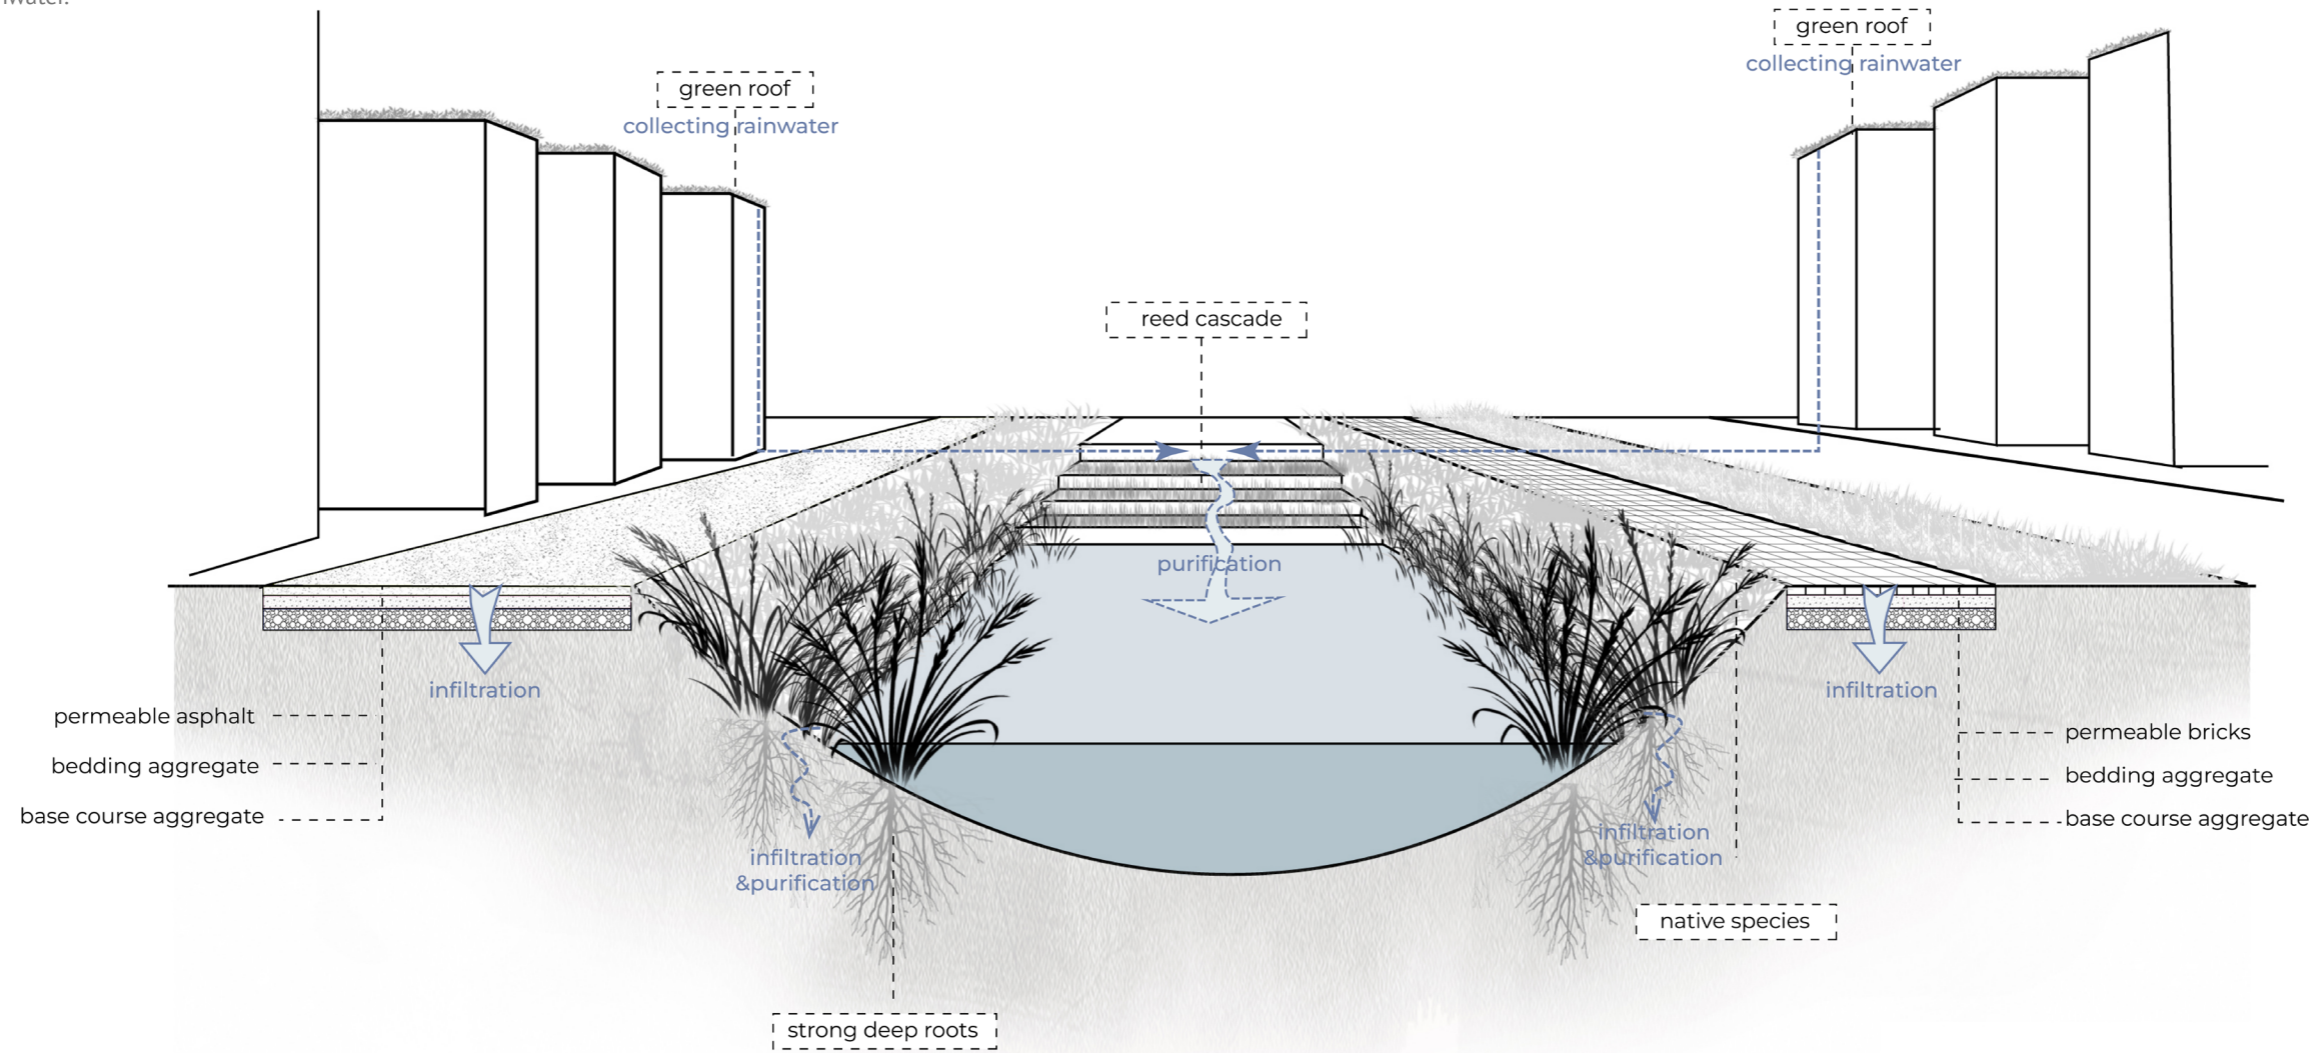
Section c-c' detail: experiment of adding bioswale 2
